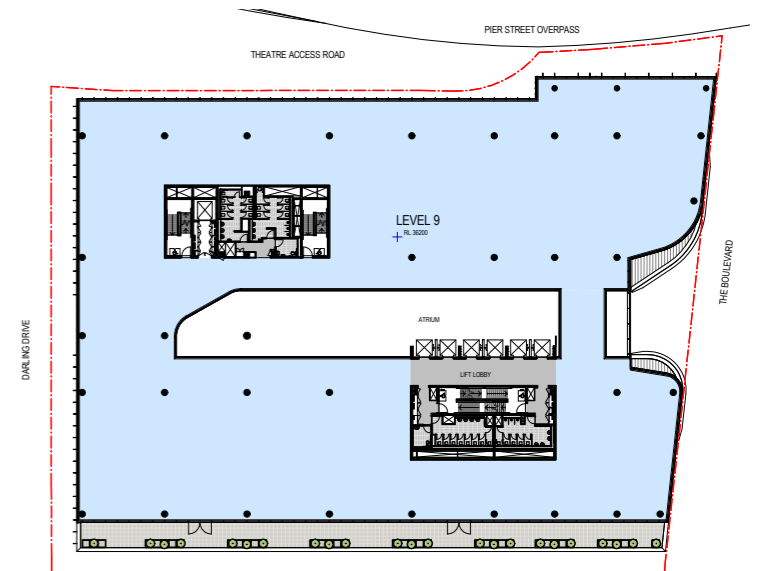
Section 96 NW Plot proposed Level 9 Plan
